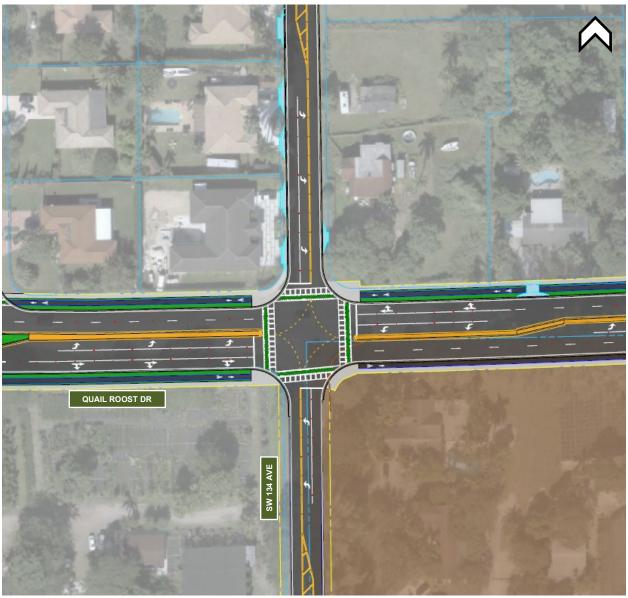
SR 994/Quail Roost Dr and SW 134th Avenue Intersection
